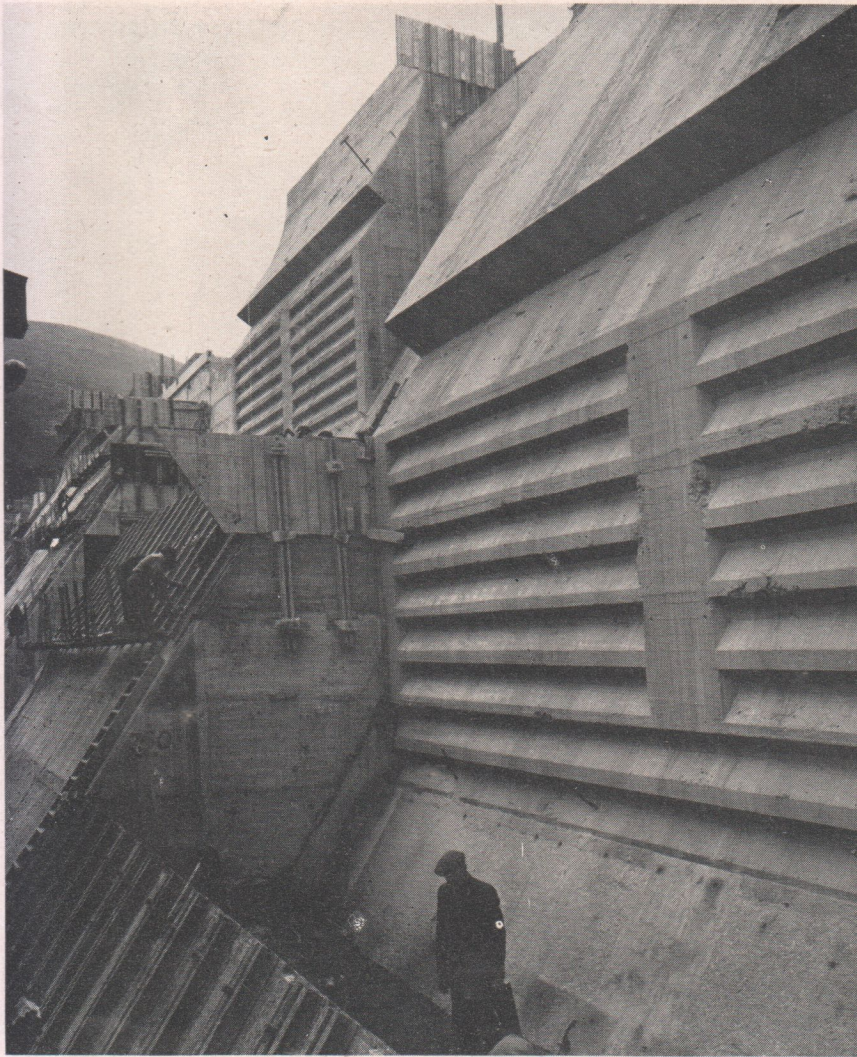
Blocks 16 and 17 carried up to full height with a vertical downstream face provided with tothing to engage the backing concrete
